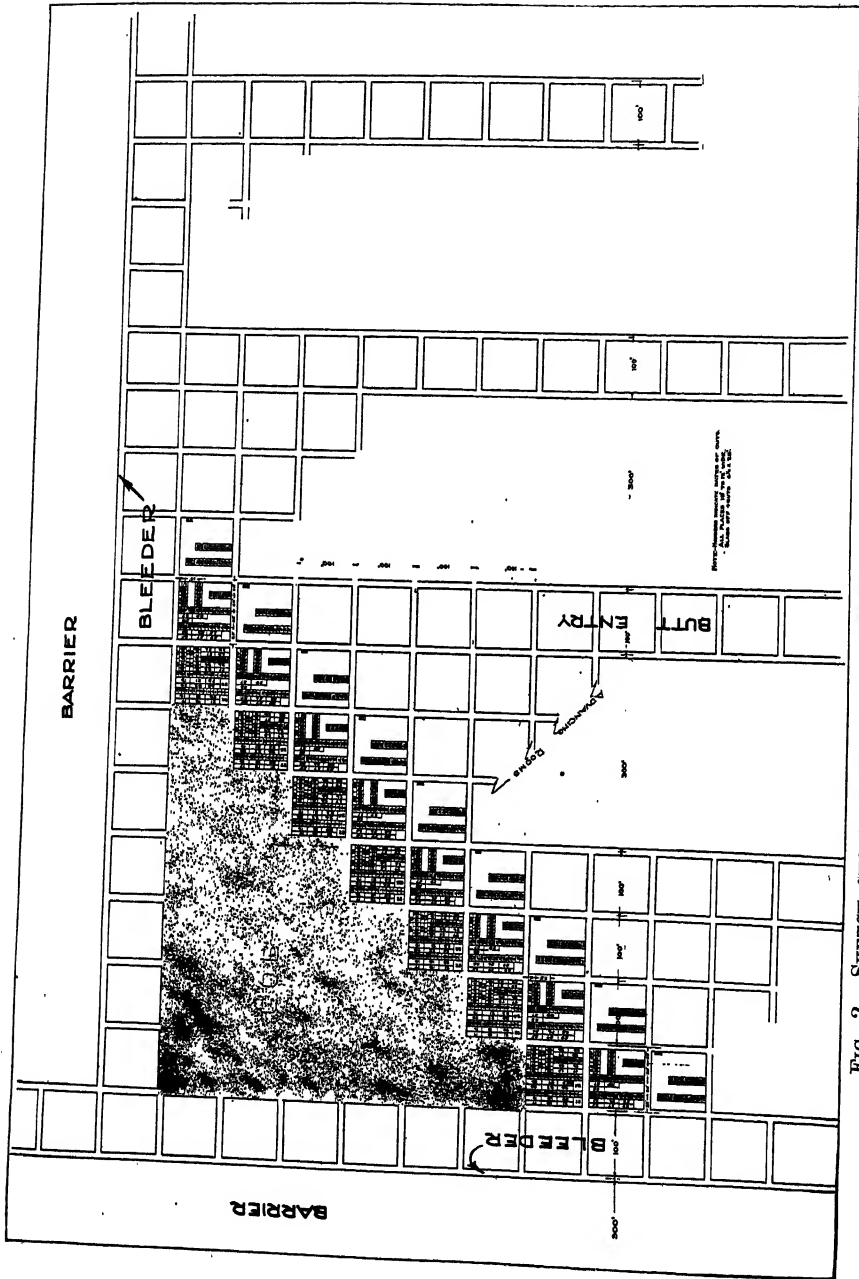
SKETCH SHOWING METHOD OF DRAWING PILLARS AT NEMACOLIN MINE.
